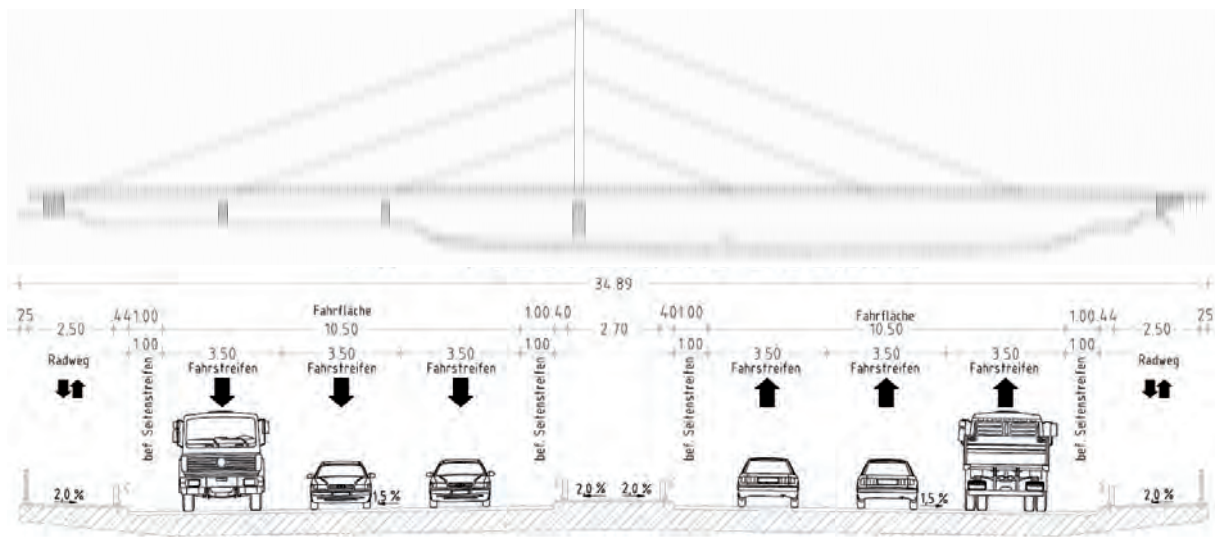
Side view (top) and cross-section of the deck slab (bottom) of the original Voest bridge from 1973 (ASFINAG, 2013)
